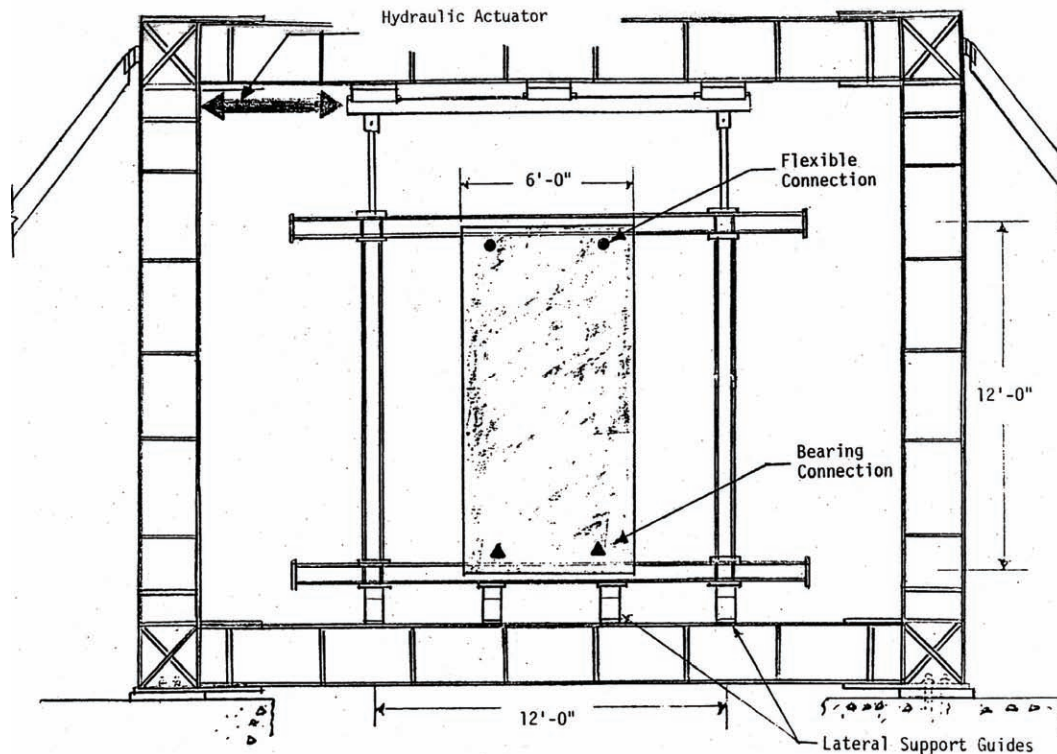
Example test setup for testing cladding panels on the University of Idaho facility
